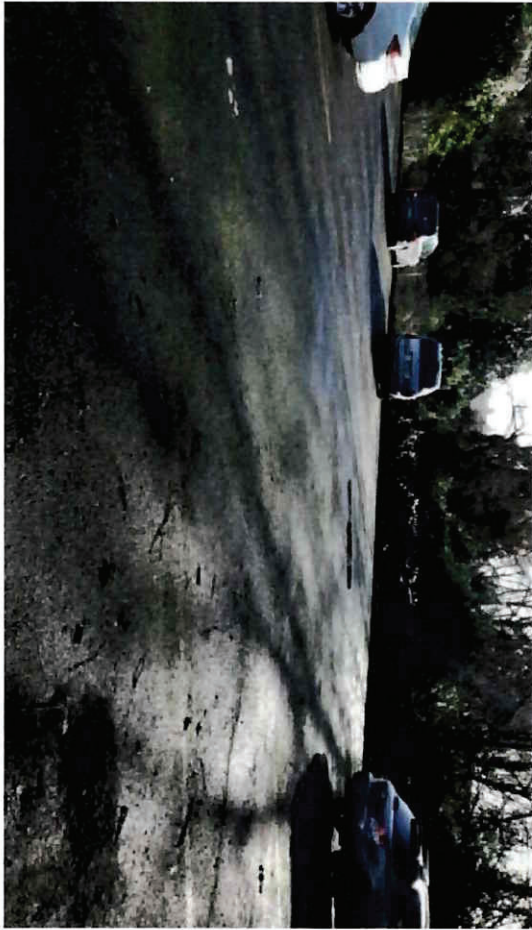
Photo A. View facing southerly of the on-site paved VC and the off-site Primary Protected Water Feature (pond) in the background.
